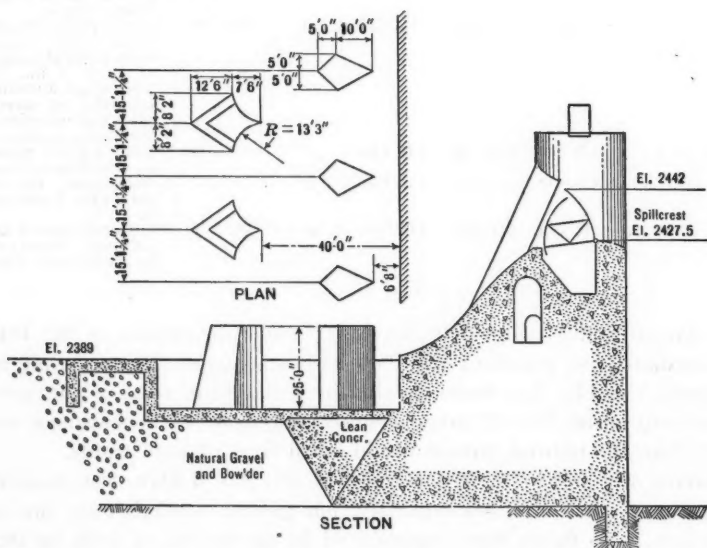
ARRANGEMENT OF BAFFLE-PIERS ADOPTED FOR PIT NO. 4 DAM.
